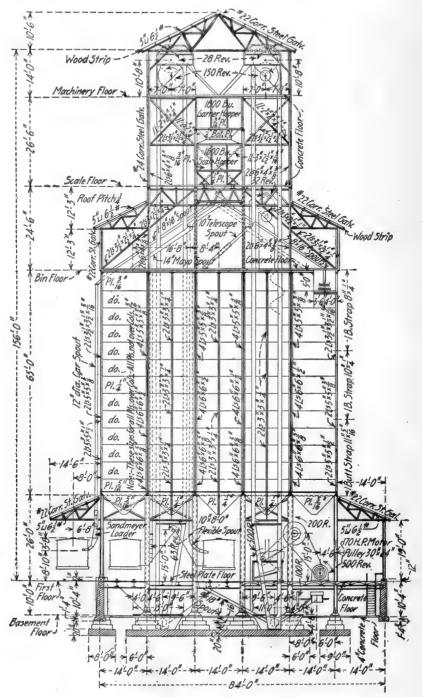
TRANSVERSE SECTION OF WORKING HOUSE OF INDEPENDENT ELEVATOR.
